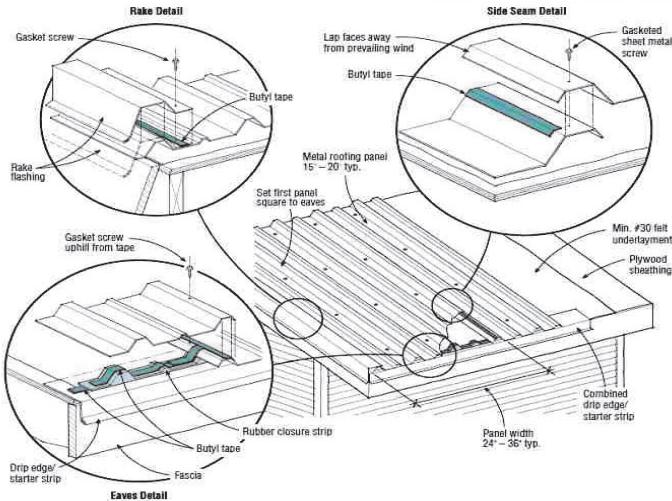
Metal roof edge flashing with rubber closure strips to seal ends, valleys and joint terminations for airtightness
